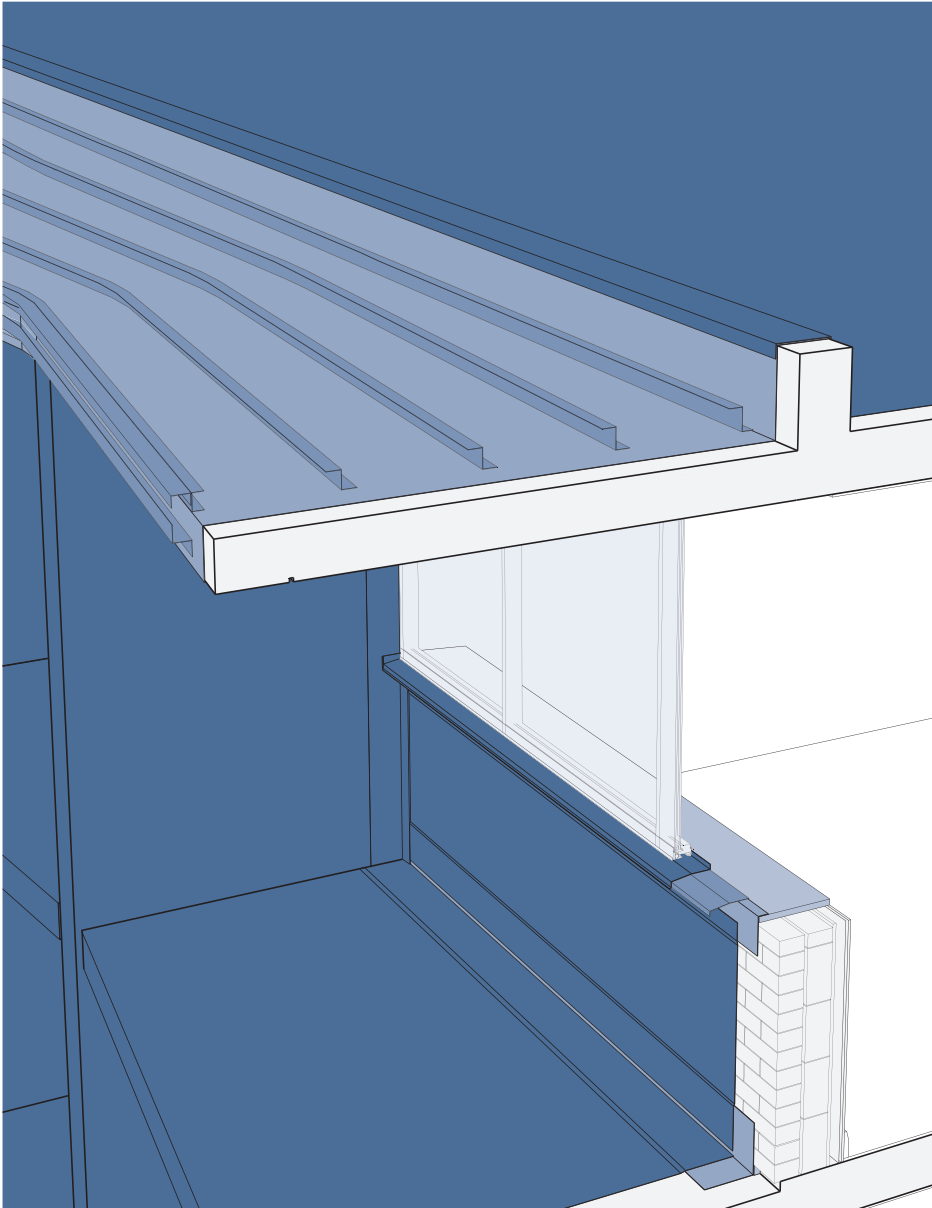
A waterproofing membrane(s) is applied over the main roof section overlapping the projecting roof at the parapet.
